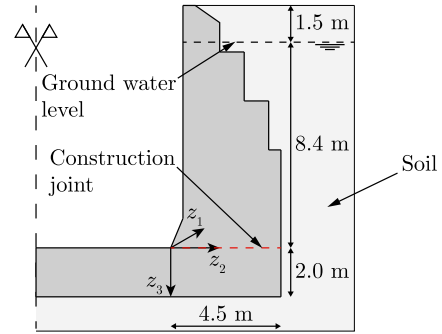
Half cross section of a ship lock chamber with construction joint between base slab and chamber wall.
